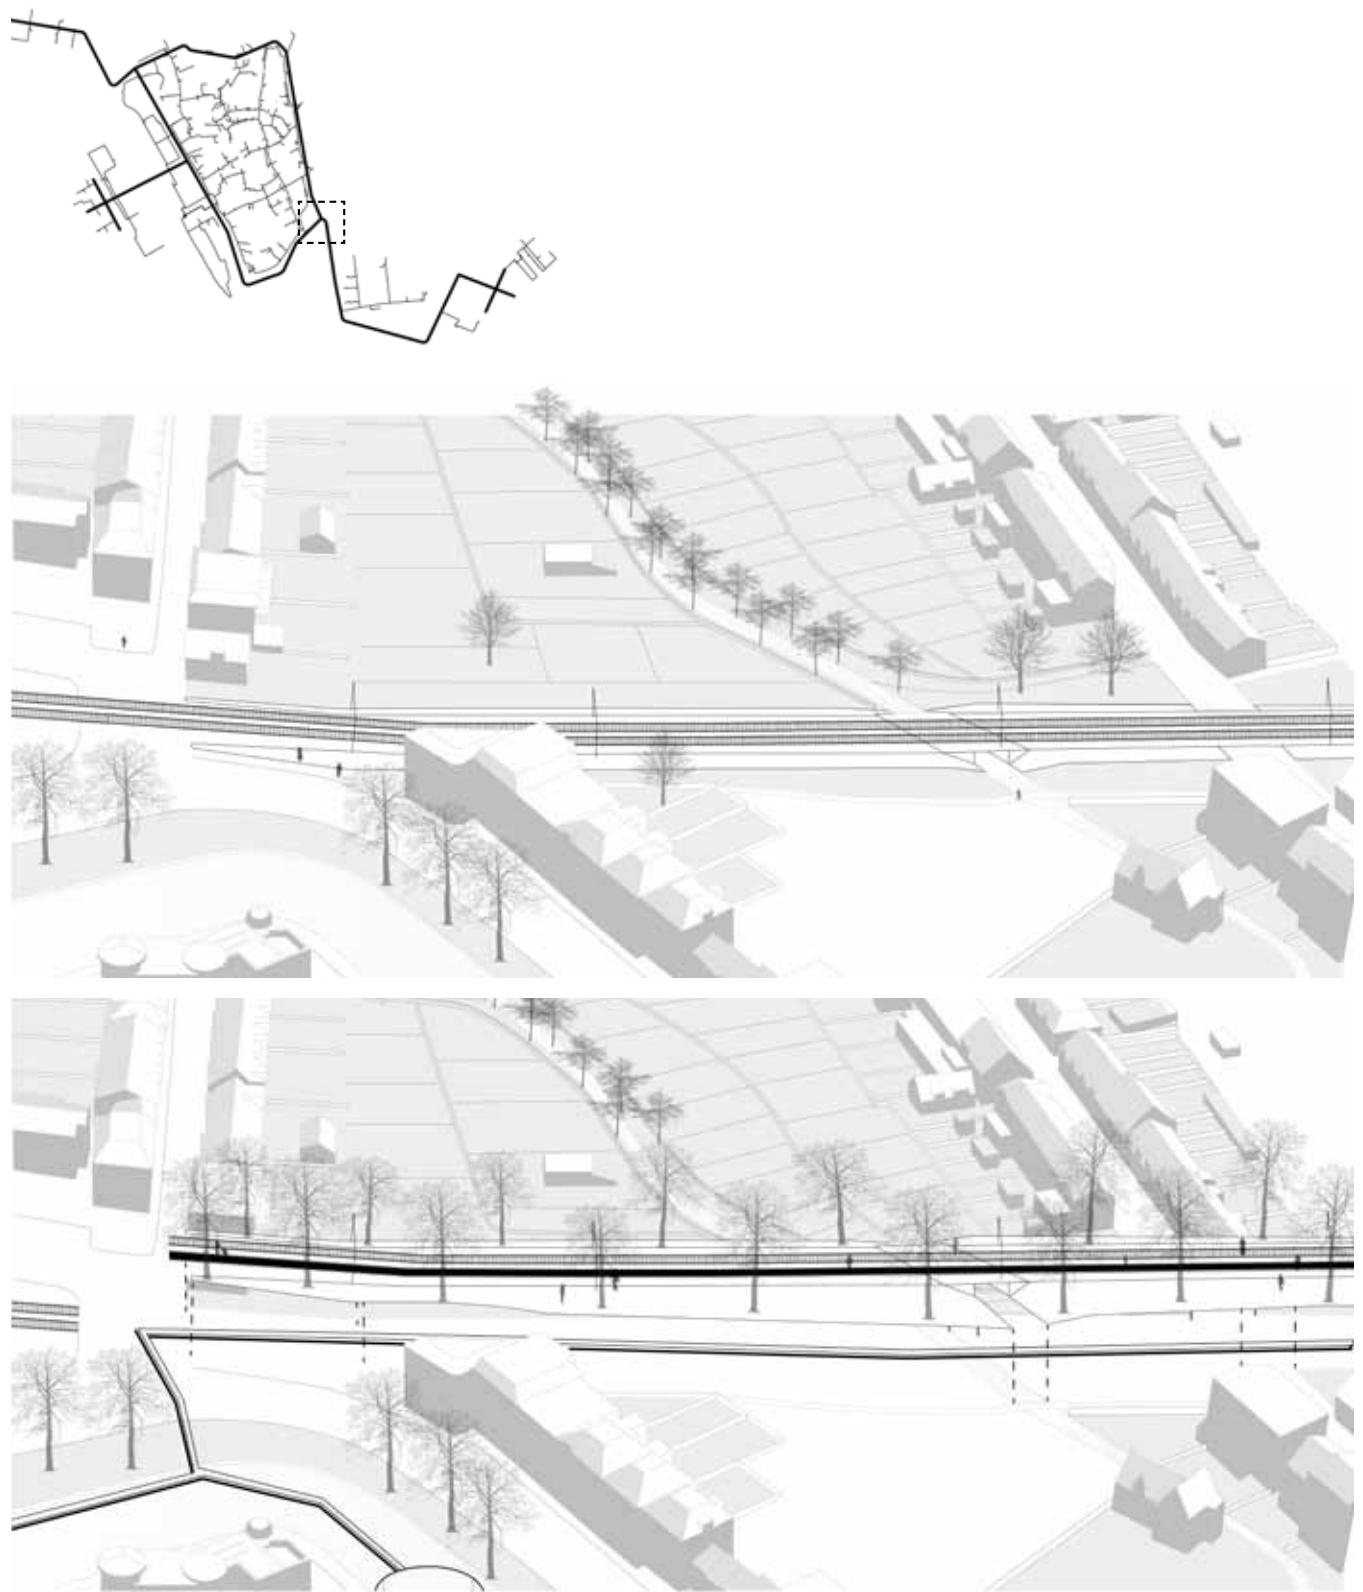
Detail plan of the Singel/Zonstraat (current and future)
